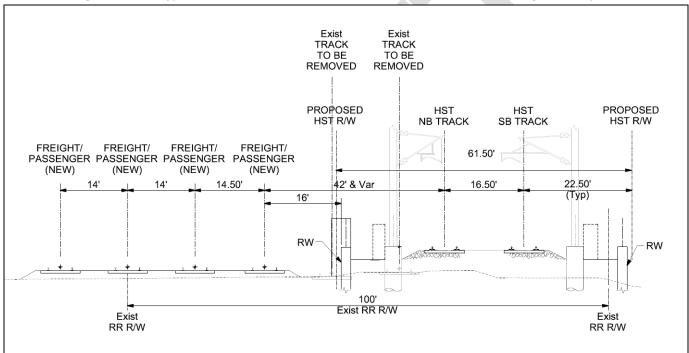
Typical Cross-Section – Pico Rivera Rail Yard – Shifted Track Alignment Option
